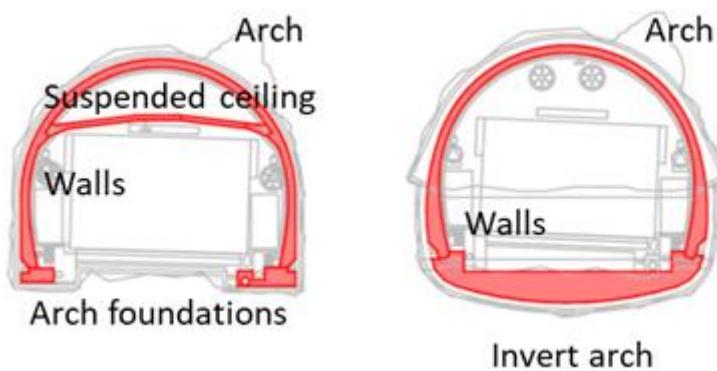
Typical cast in situ inner linings in conventional tunnelling (courtesy ILF)
